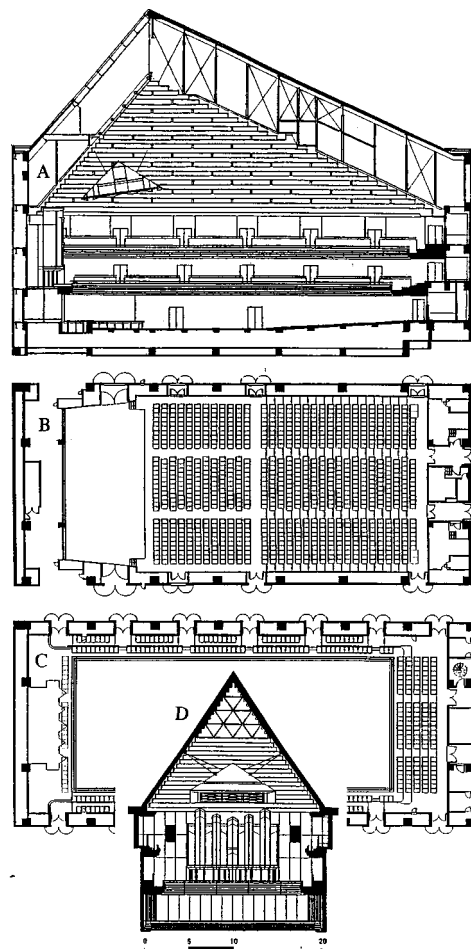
The TOC concert hall as built: (a) Longitudinal cross section. (b) Main floor. (c) First balcony. (d) Lateral cross section at highest ceiling point. The second balcony is similar to the first, except it has three rows of seats at the rear. Many variations were presented originally by the architect for acoustical evaluation. Architect: Takahiko Yanagisawa, TAK Associated Architects, Tokyo.
